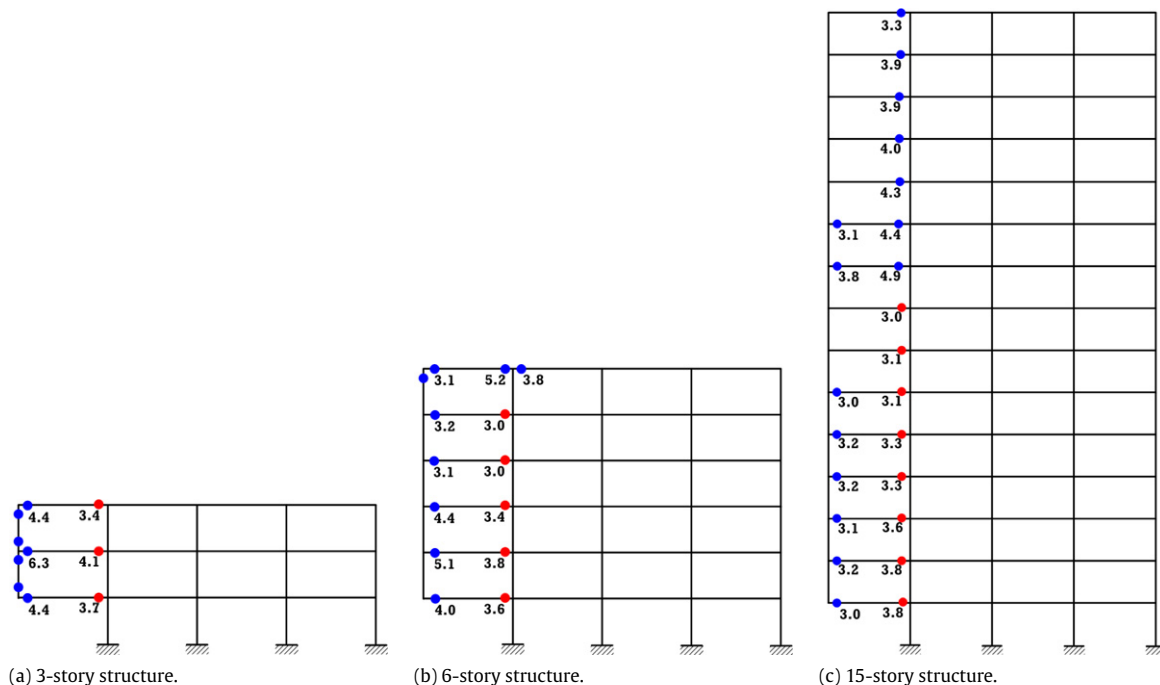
Locations of hinges when the first-story corner column of the LLRS structures was removed – after second iteration (GSA 2003).
